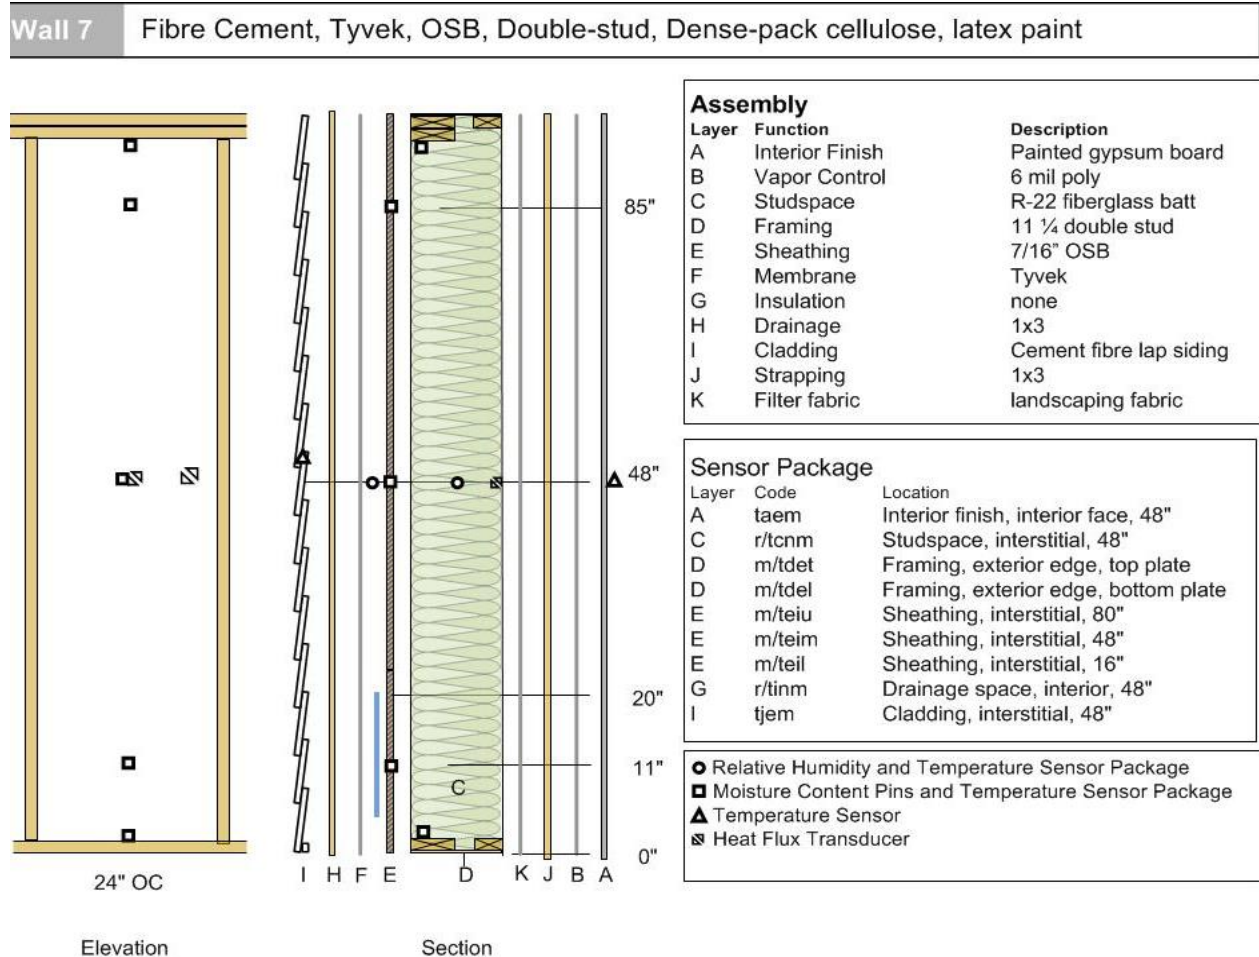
Elevation and exploded vertical cross-section of the center bay of the double stud wall panel
